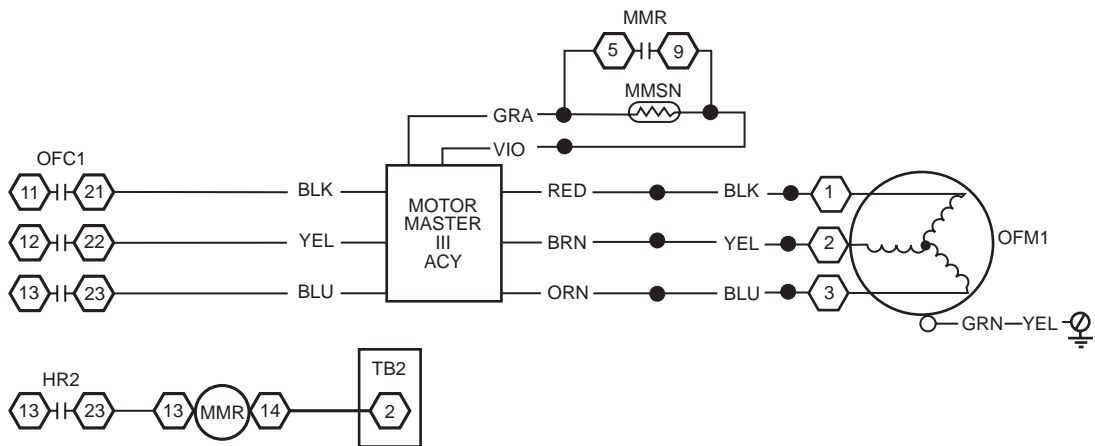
Motormaster III Device Wiring, 48/50EJ,EK,EW,EY024-034 — 575-3-60 Units
